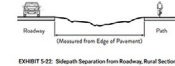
Subpath Separation from Roadway, Road Section
